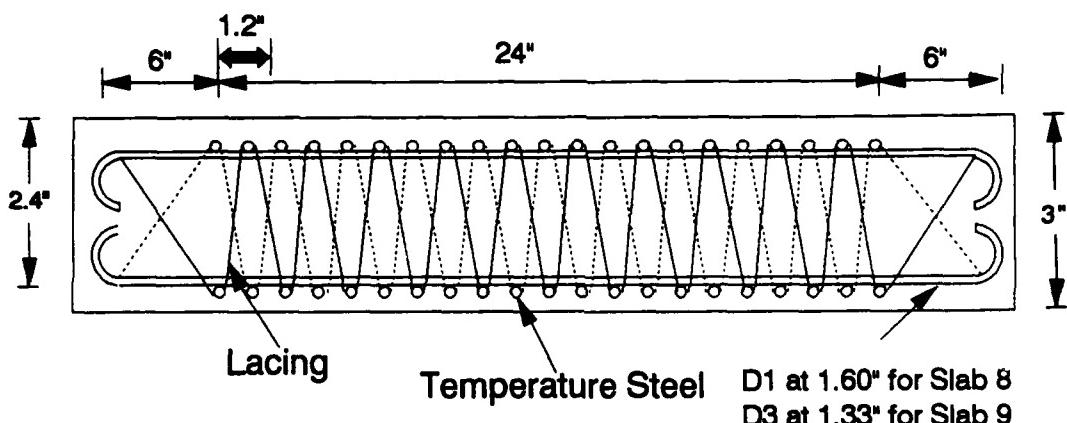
Sectional View Through Length of Slab Nos. 8 and 9
